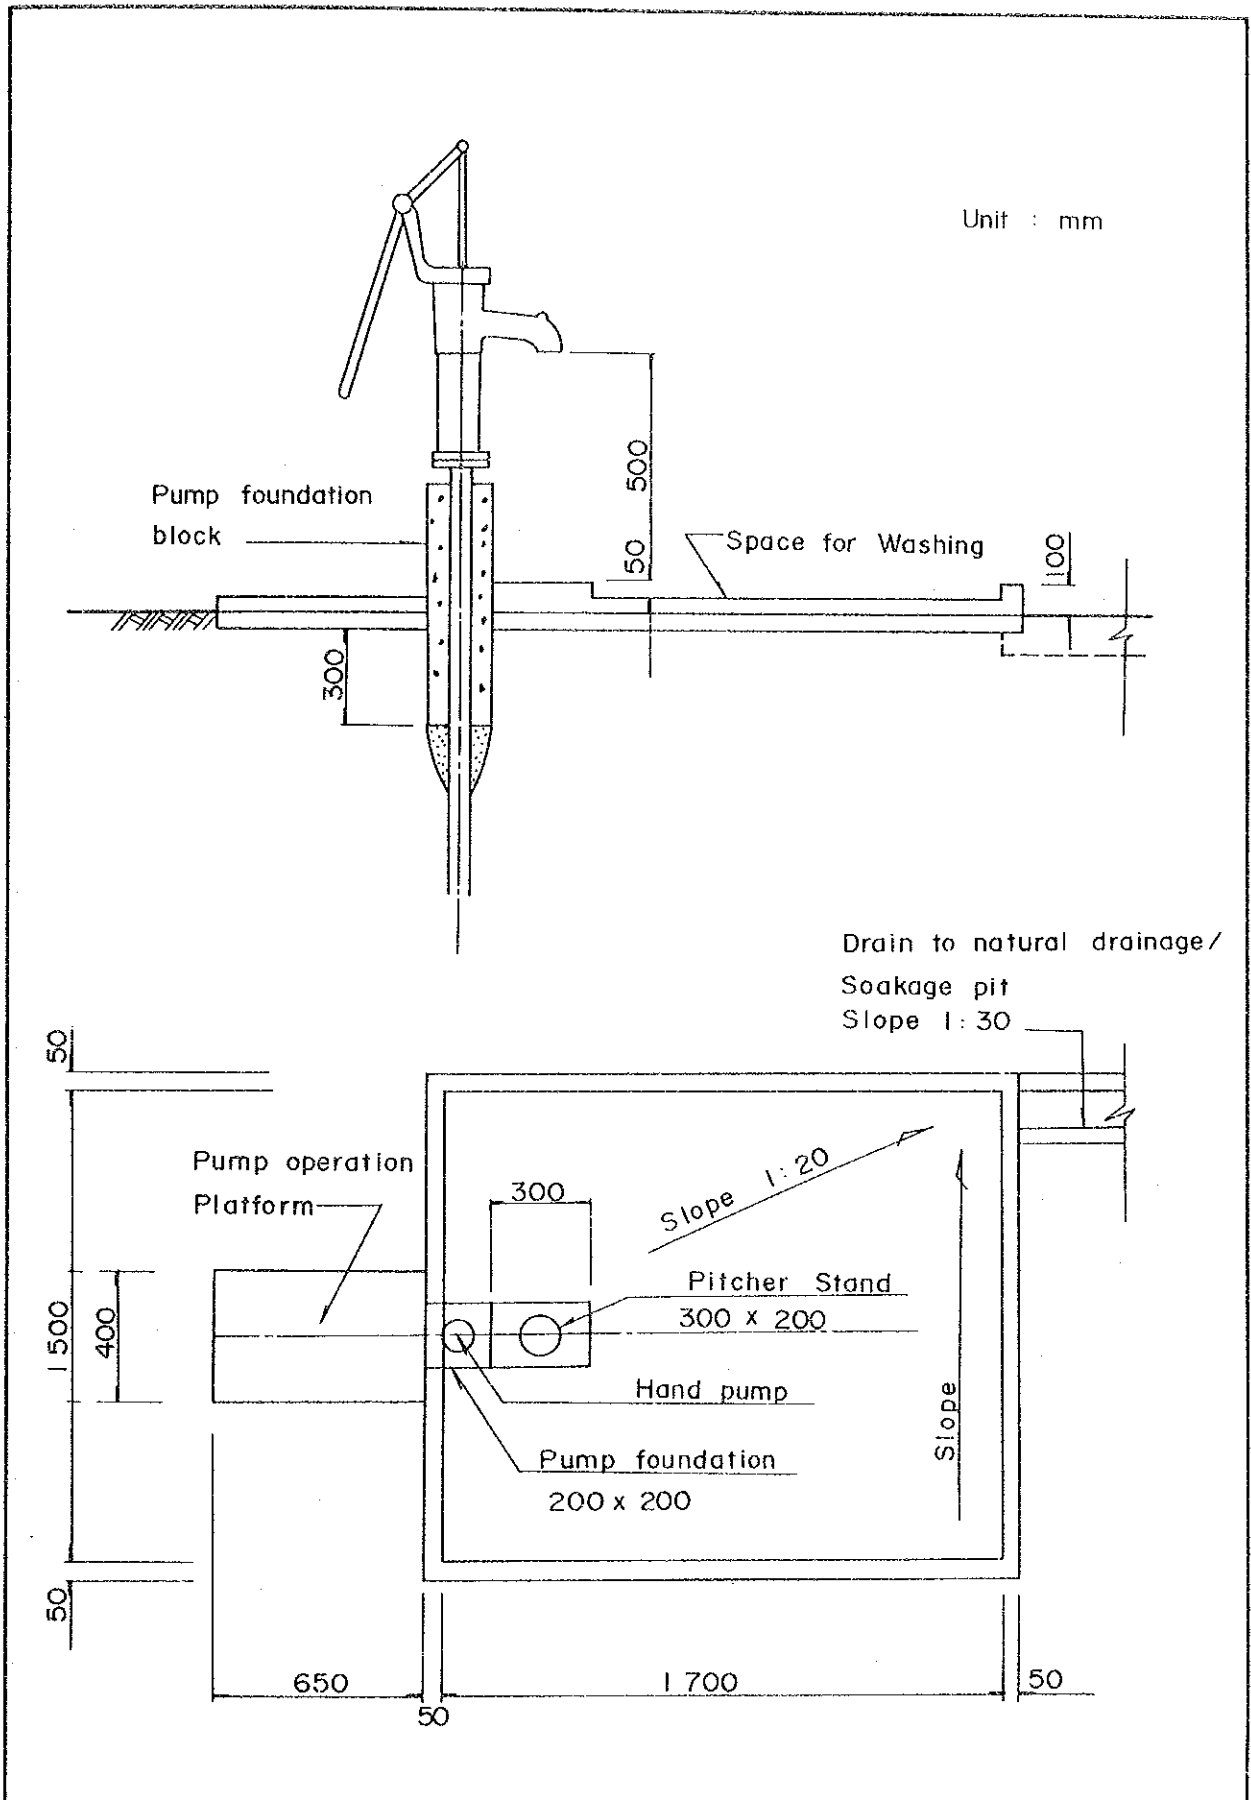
GENERAL PLAN OF WATER SUPPLY FACILITY - TYPE I -
